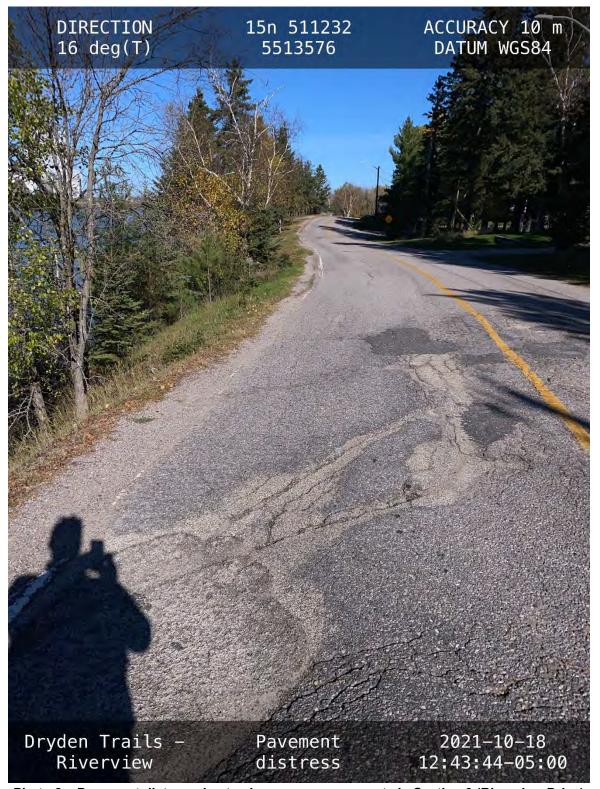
Pavement distress due to slope creep movements in Section 3 (Riverview Drive)
